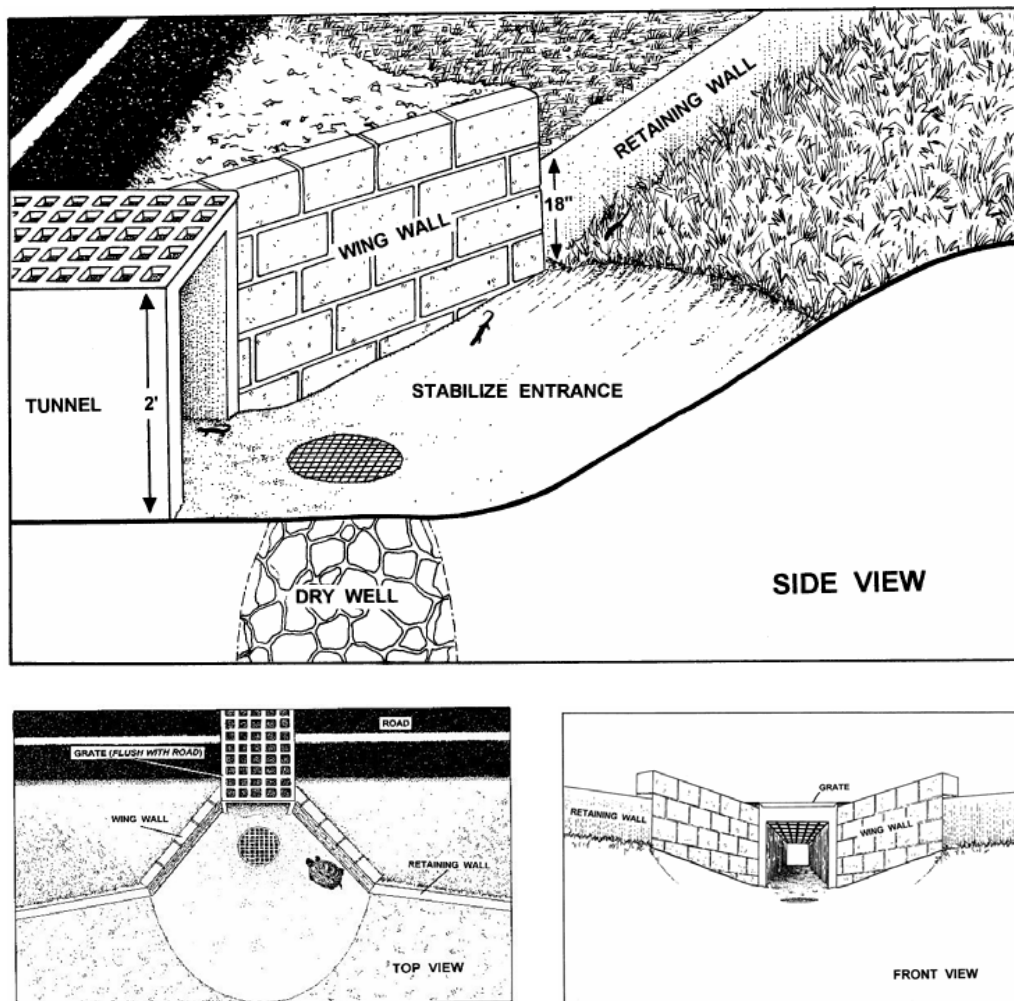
Schematic drawings of an amphibian tunnel. (From Jackson 2003. Illustrations by Tamara Sayre. Used with permission.)
